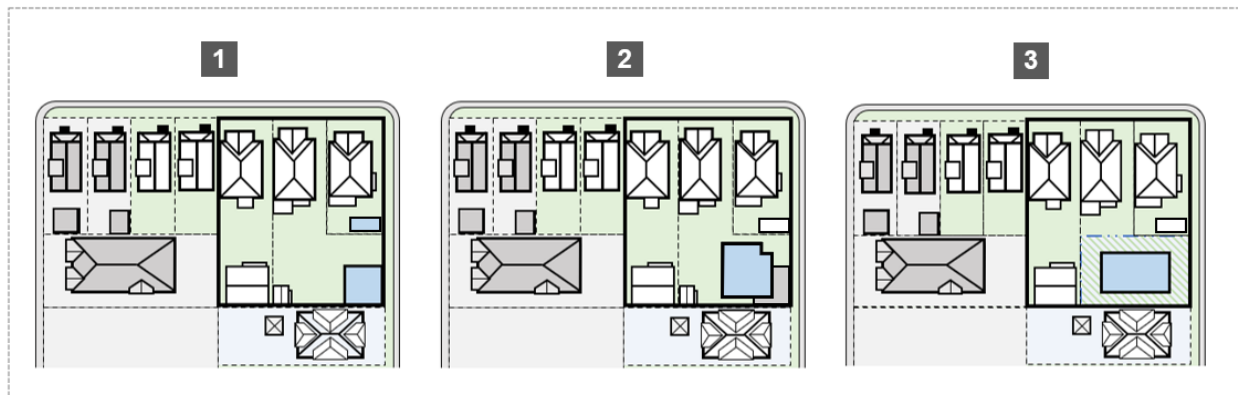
Combined Development Conceptual Illustration (Plan View)
